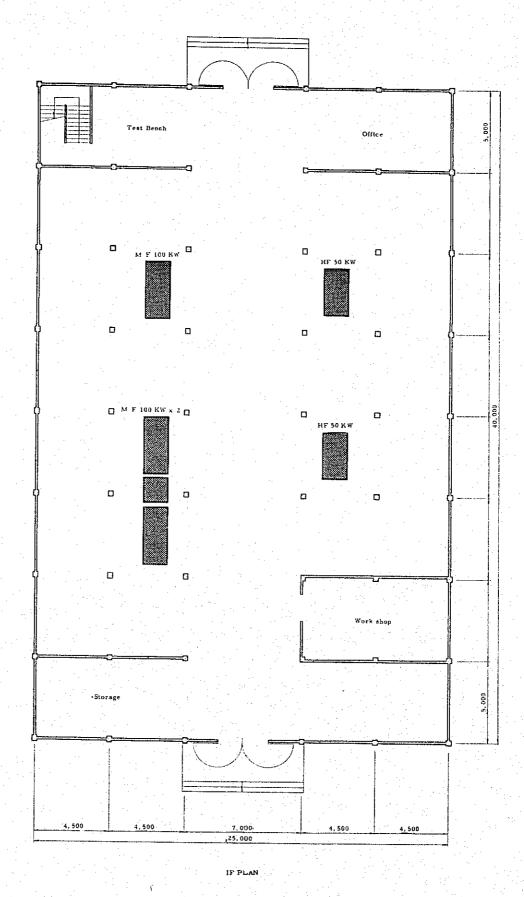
Floor PLAN of NEW RADIO TRANSMITTER Building NO. 1
